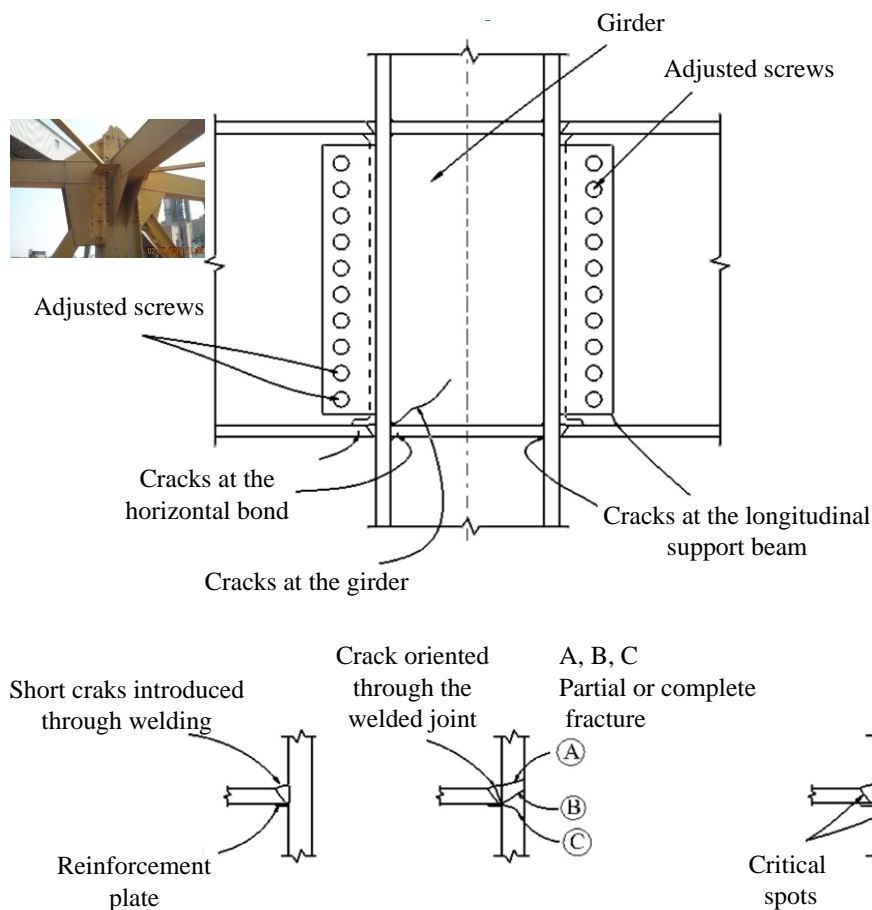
Locations of welded joints in which fatigue cracks mainly occur, /15/.
